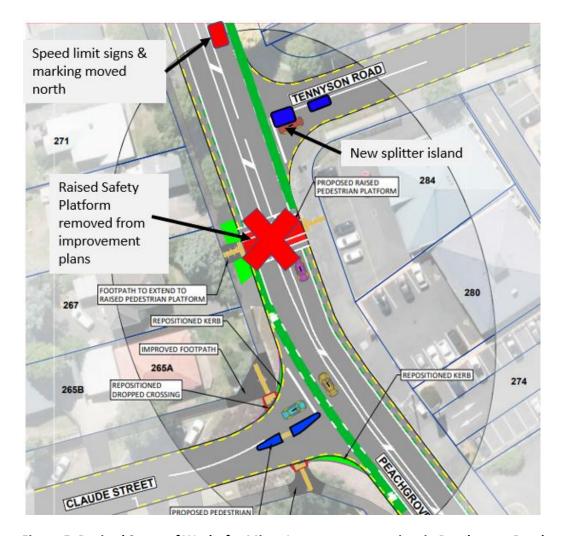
Revised Scope of Works for Minor Improvements project in Peachgrove Road
